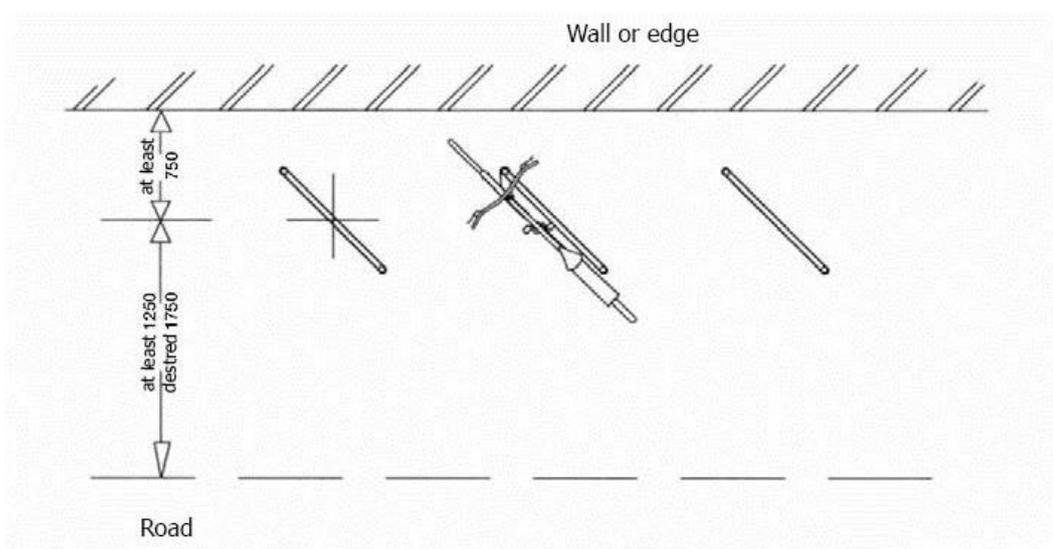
U-shaped rack located at 45 degrees to the wall and flow of motorized traffic
